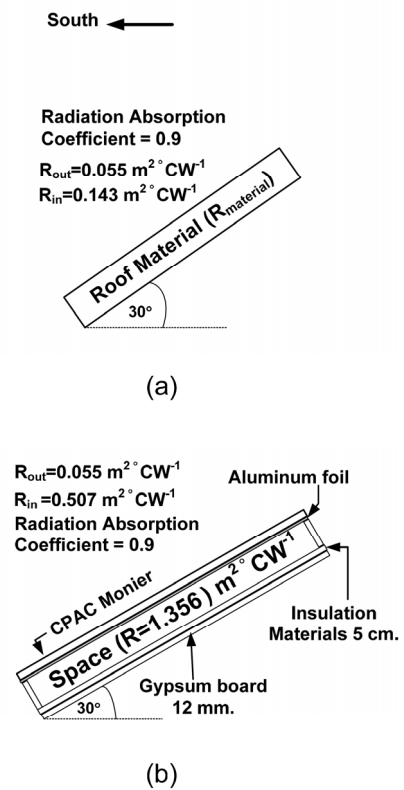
Roof models; (a) Single material roof model and (b) Mixed roof material model
